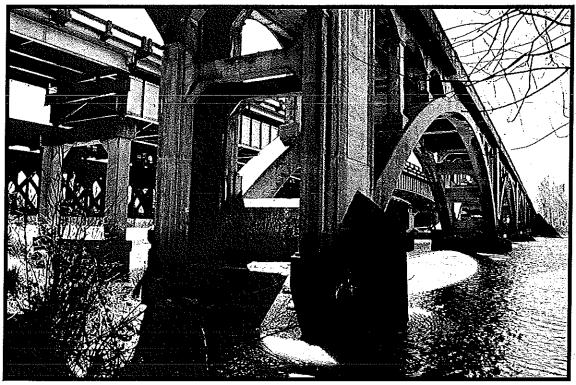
Looking southeast toward upstream elevation of Wilcox Bridge. US 29 and North Carolina Railroad bridges at left.
